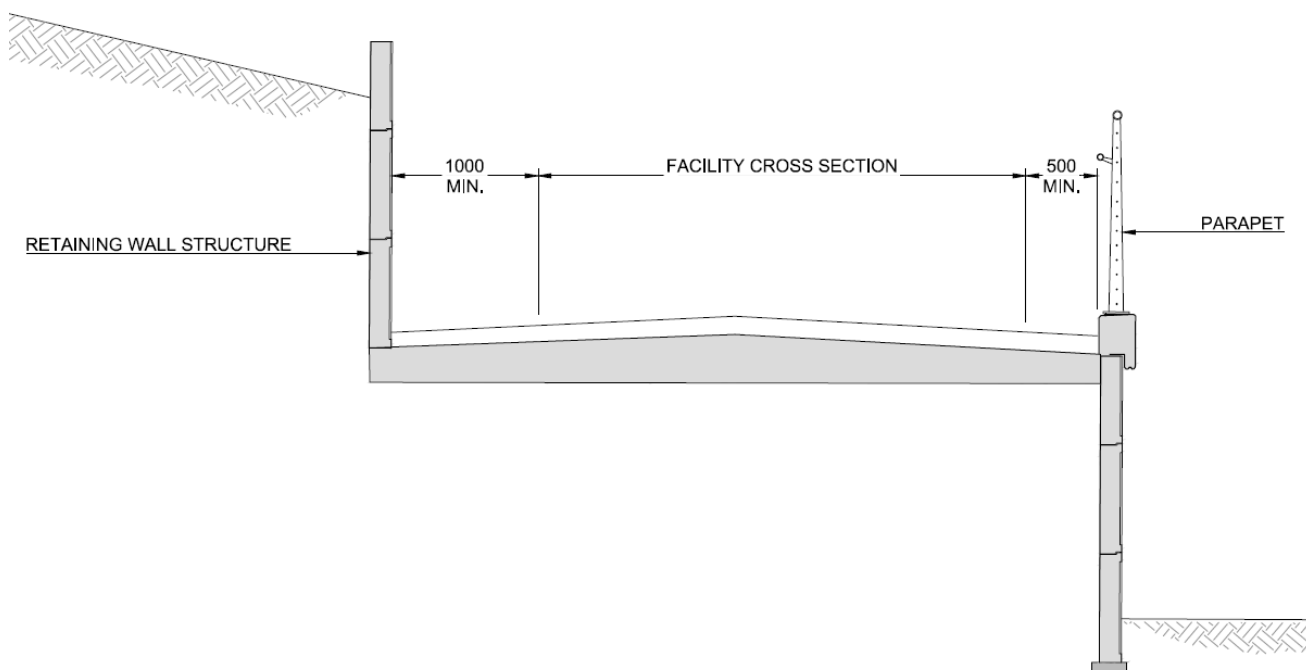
Typical Cross Section at Retaining Wall Structure
